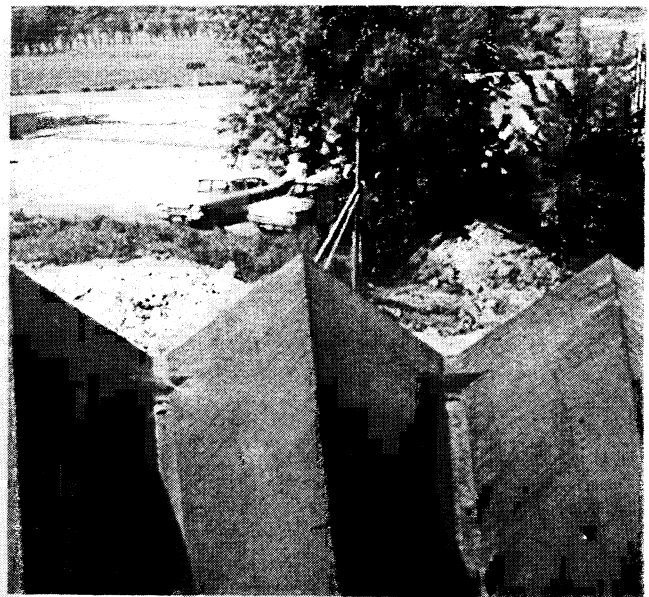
Plate dam beyond each drain helps to tunnel water into drain and stiffen the folded plate over the column
